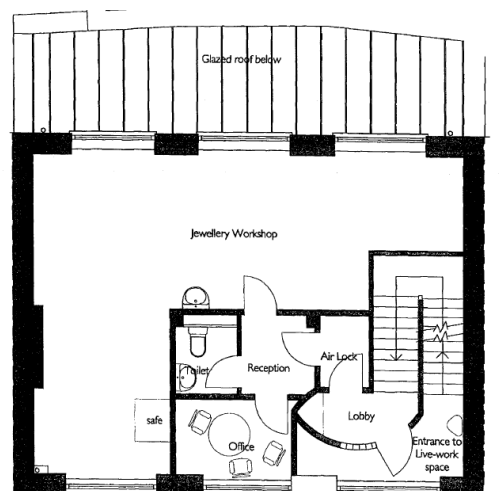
7 Bleeding Heart Yard First Floor Plan
